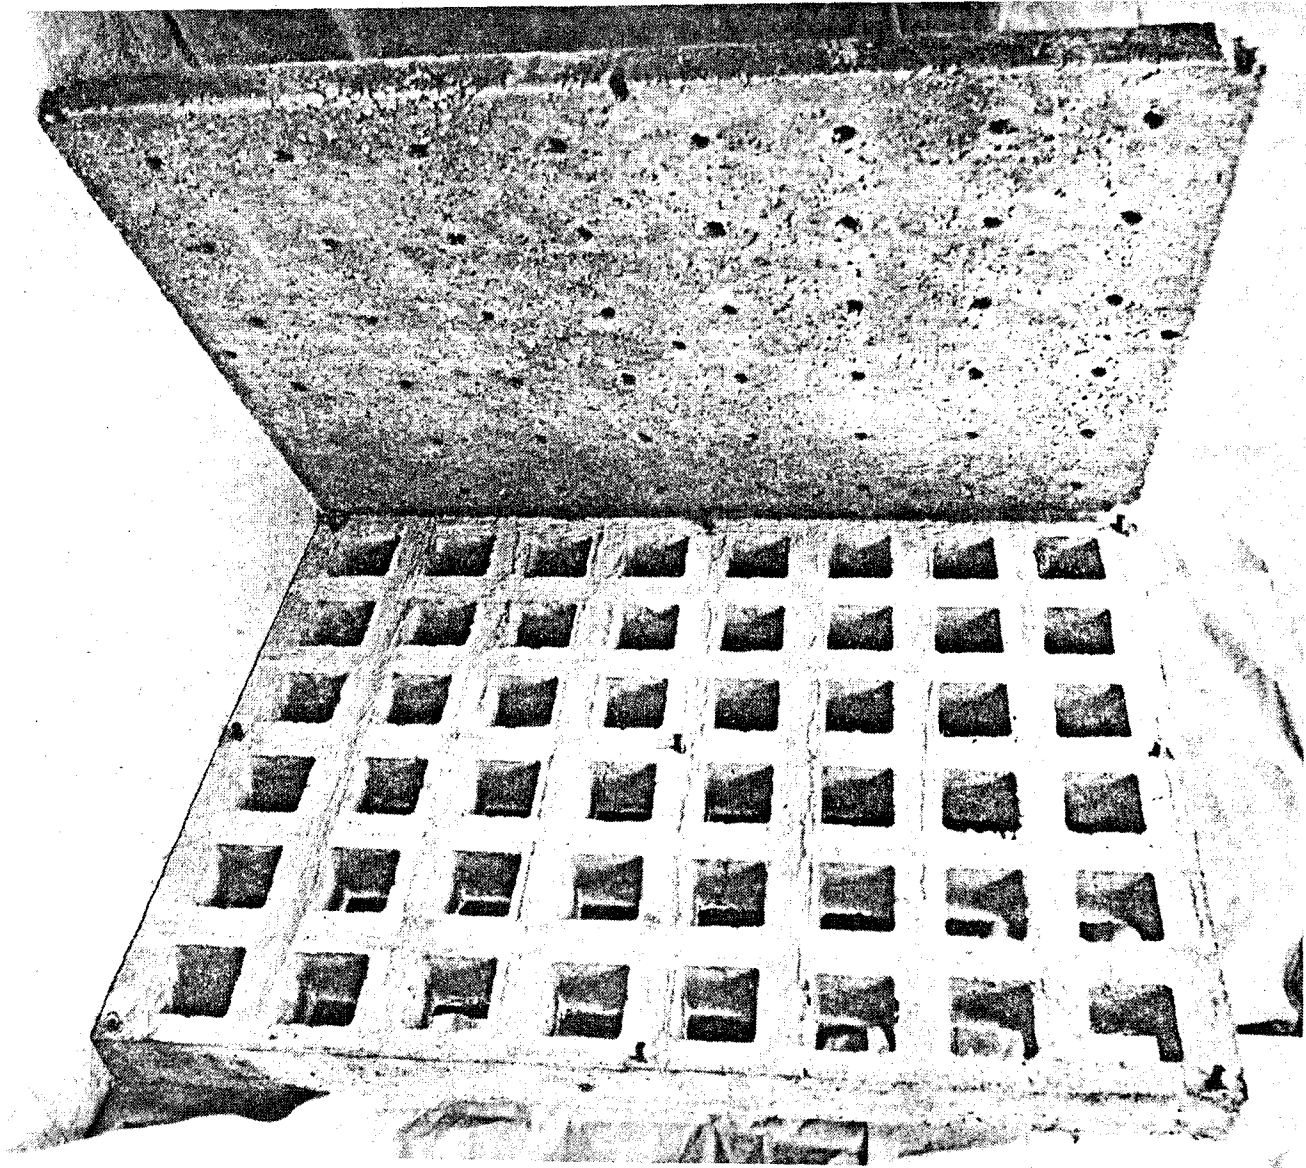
CONCRETE WEB PLUS COVER PAVEMENT
